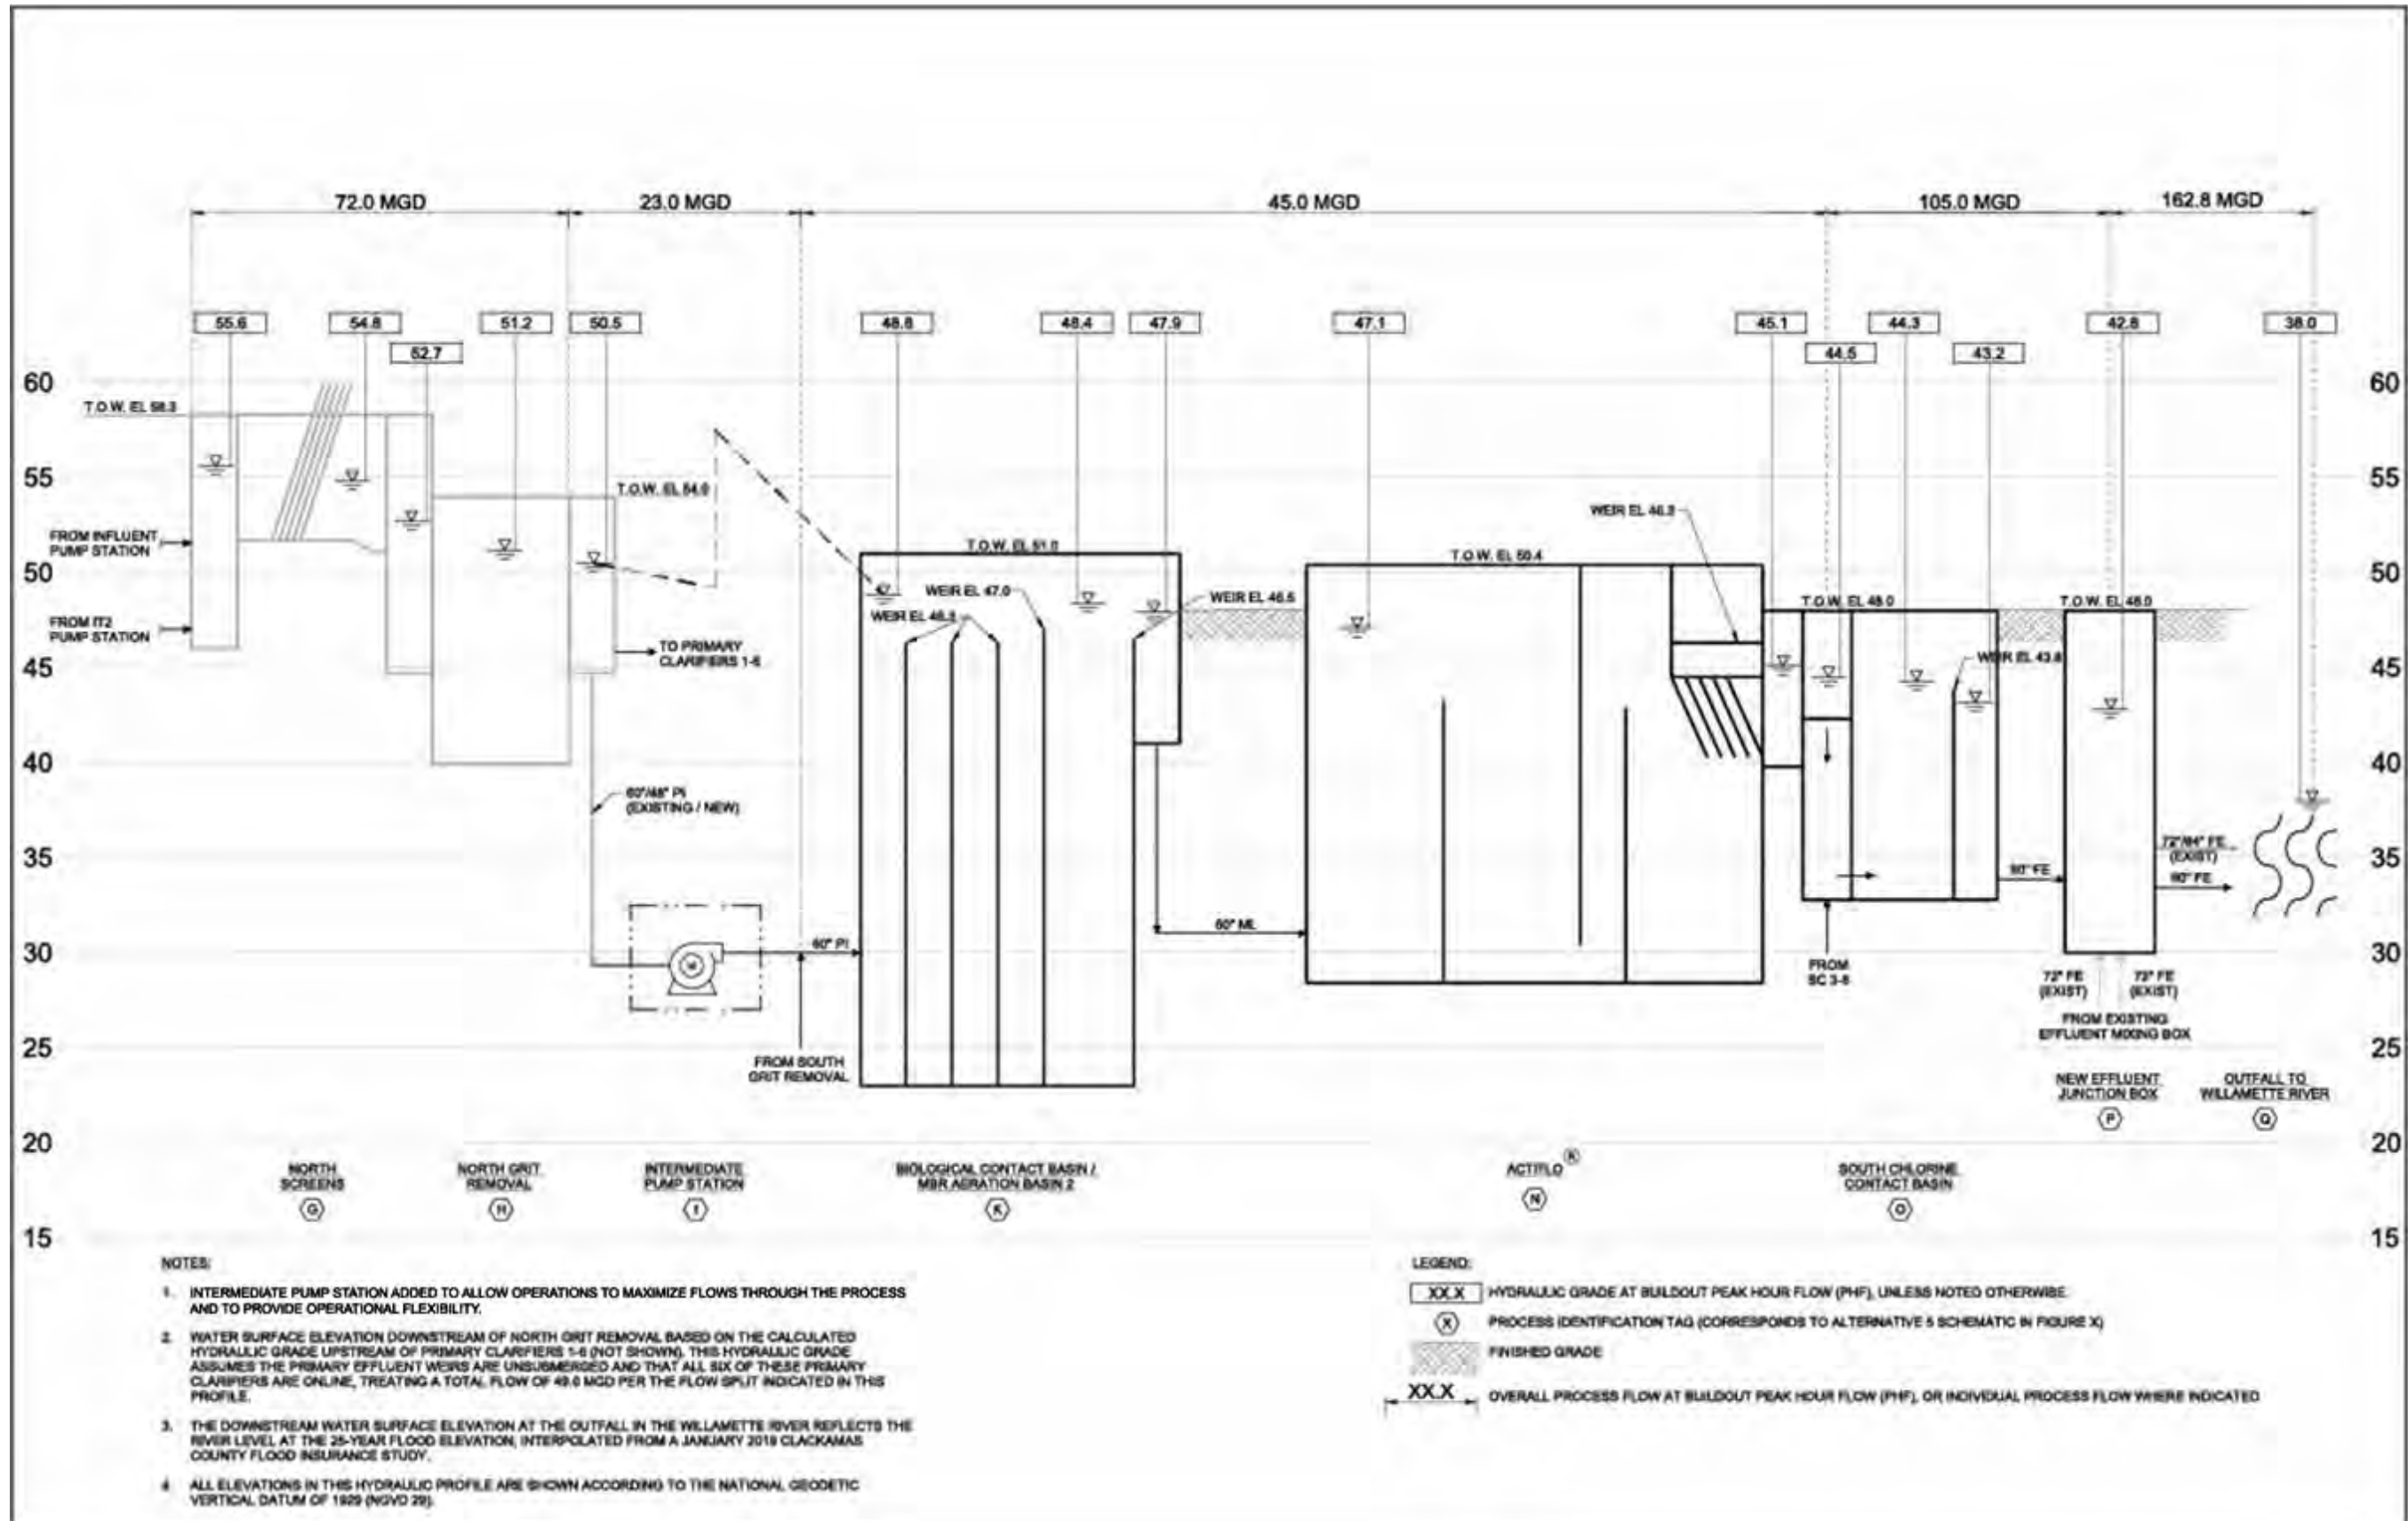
Tri-City WRRF Recommended Alternative North/South Plant Transfer Hydraulic Profile
